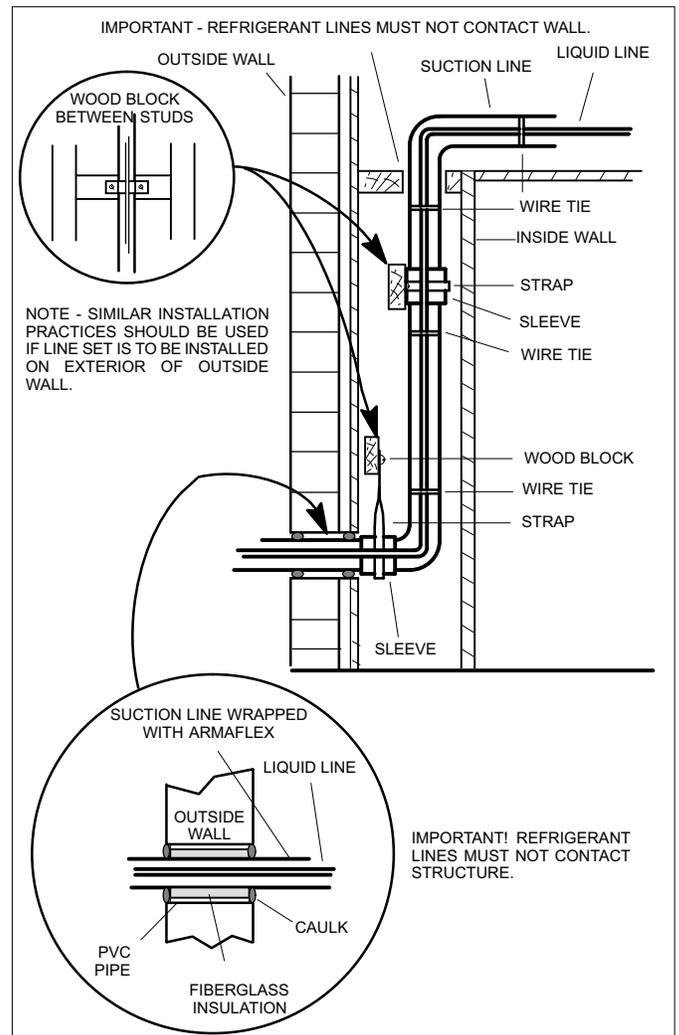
Refrigerant Line Set: Installing Vertical Runs (New Construction Shown)
